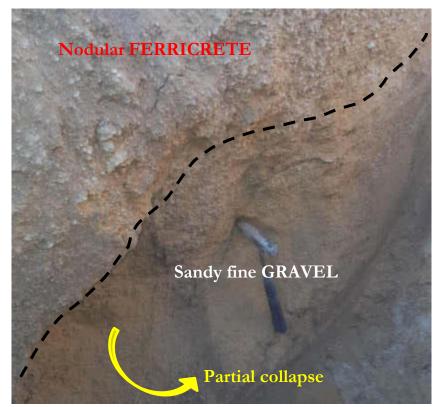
TP14 – Partial collapse of trial pit sidewall within the pinholed sandy fine gravel horizon; prior to water level rise.
